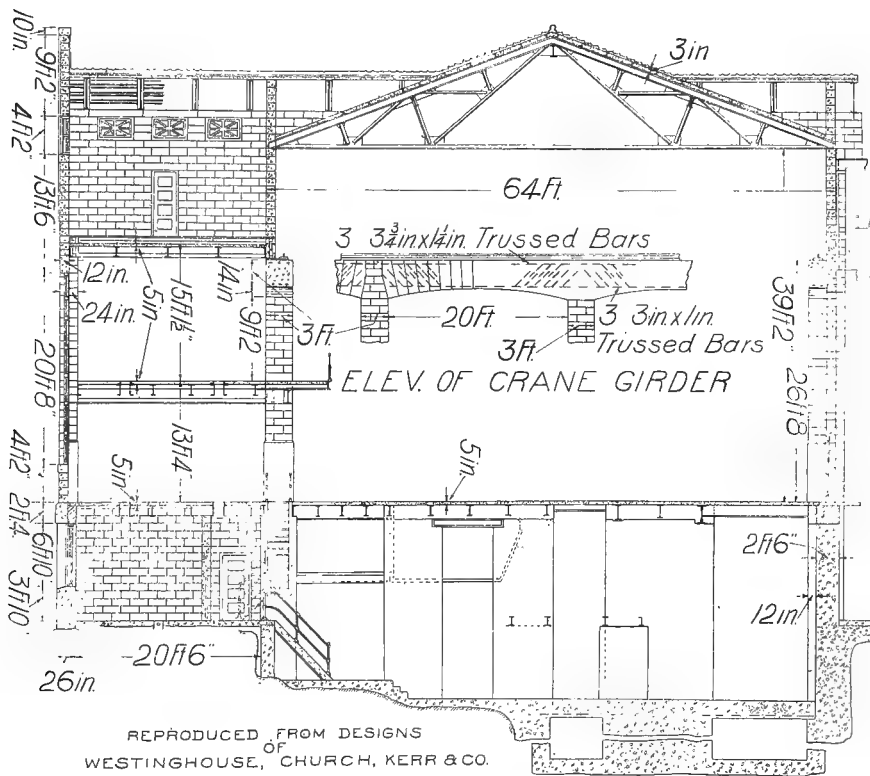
CROSS SECTION THROUGH TURBINE ROOM, COS COB POWER PLANT.
